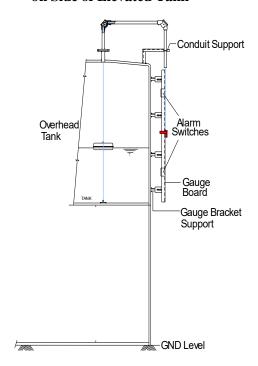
Gauge board with Full Travel Mounted below Elevated Tank
